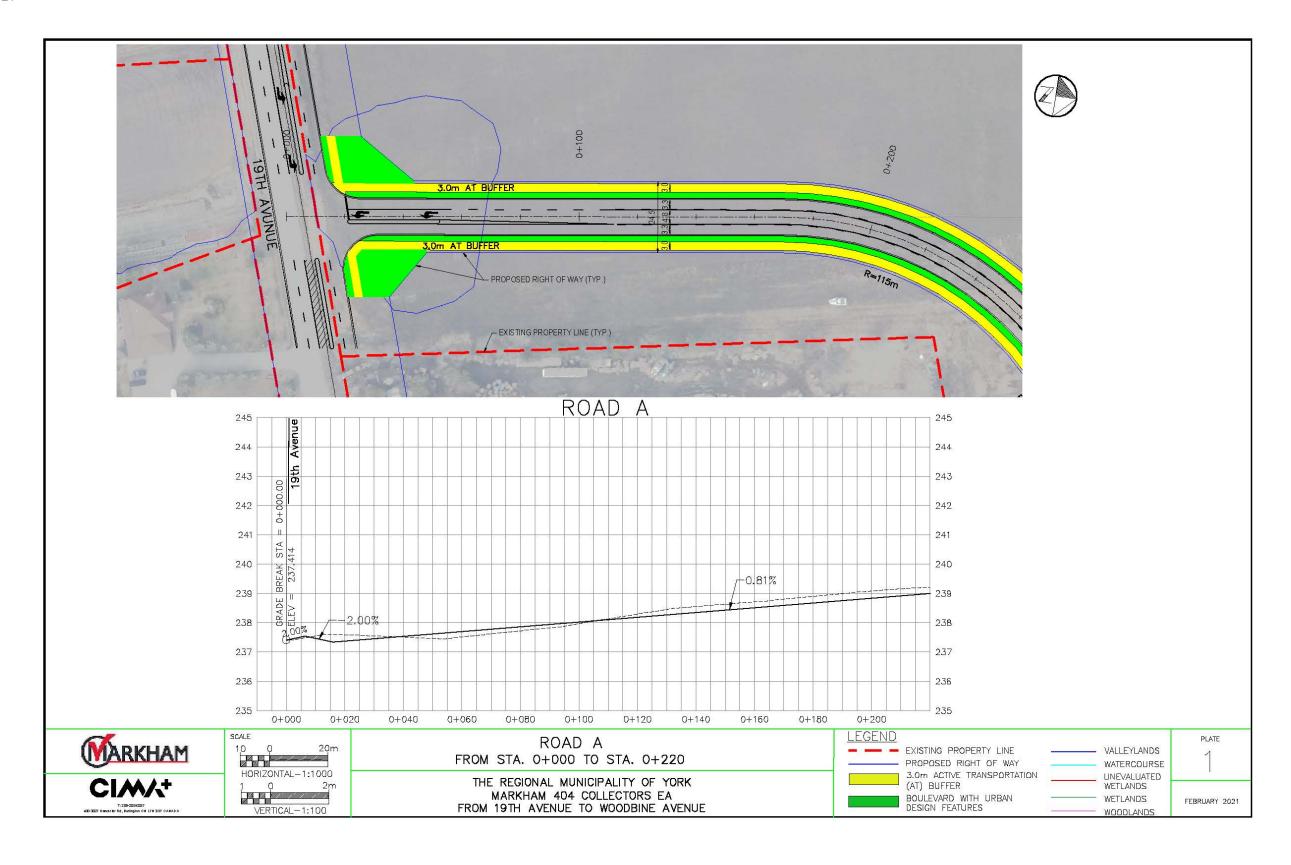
Preliminary Design Plate Road A Station 0+000 to Station 0+220
